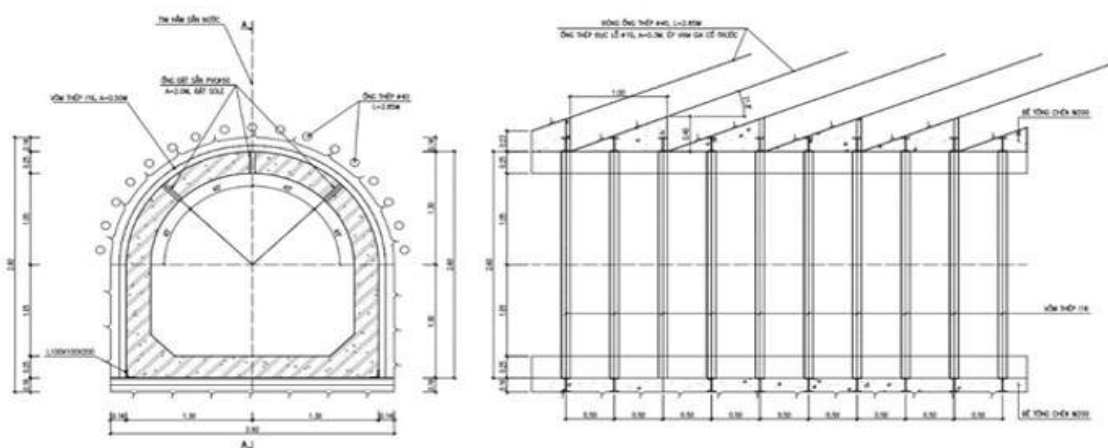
Example of pre-excitation grouting technology by tunneling through fault and layout of stacked boreholes.
